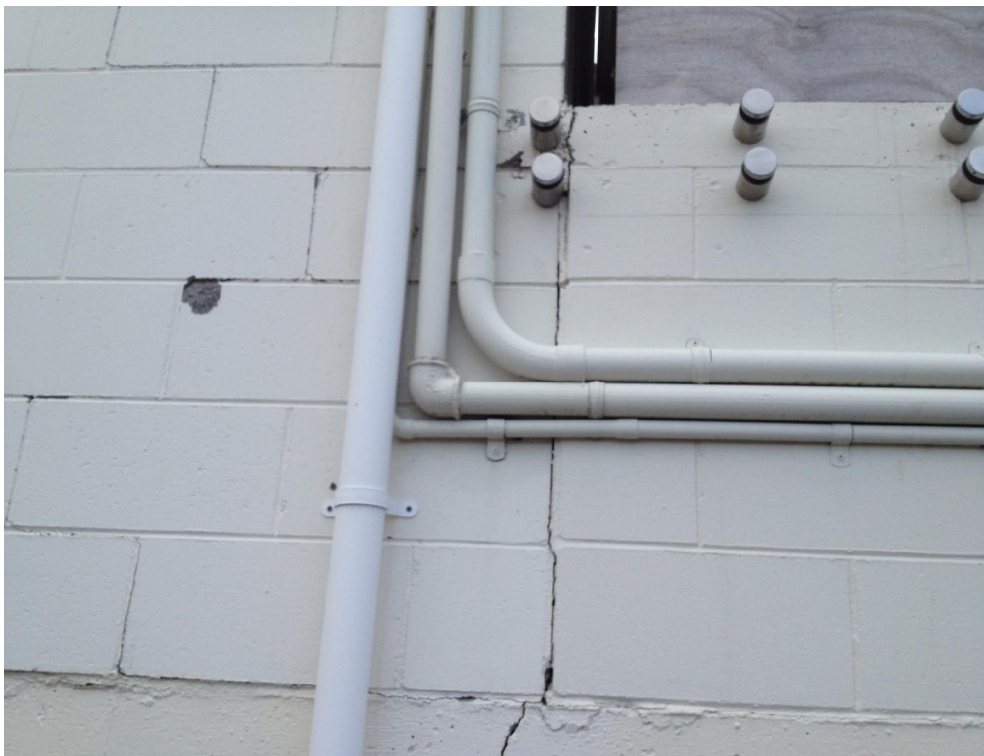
Adjacent concrete masonry block wall along driveway between Main Plant Room and Lean-to Shelter. The Lean-to Shelter is to the left of this photo (view from south).
